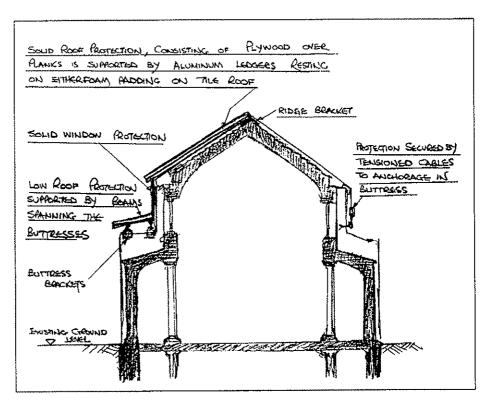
Before new construction was undertaken to the left of this church, a subcontractor was hired to design a protective system for the tile roof and clerestory windows. Drawing: Alan Shalders, Universal Builders Supply, Inc.
